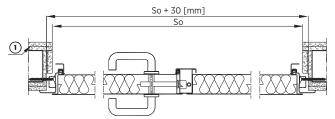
Installation of a double-leaf door with a corner frame to a masonry wall – horizontal cross-section
